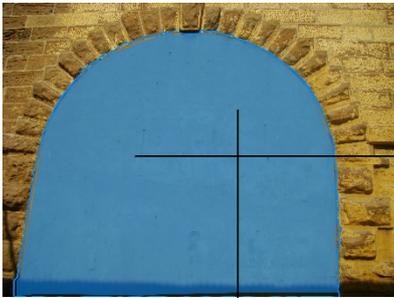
Concrete - arched openings, Barrack B, south-east elevation, 15 to 17A East wharf, KPT, Karachi.
